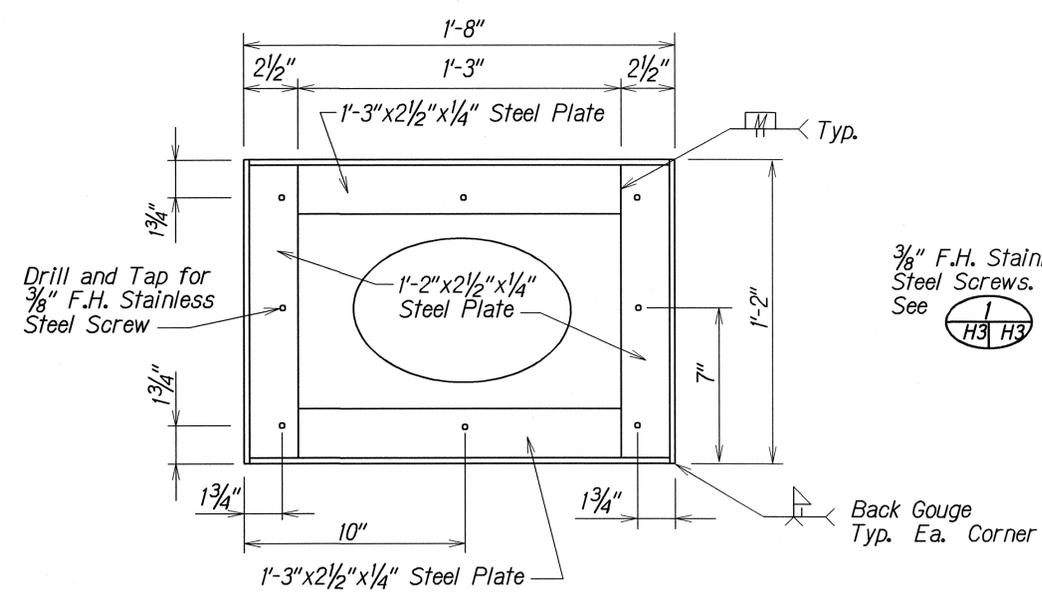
DETAILS OF TYPE "1" UNDERDRAIN OUTLET
